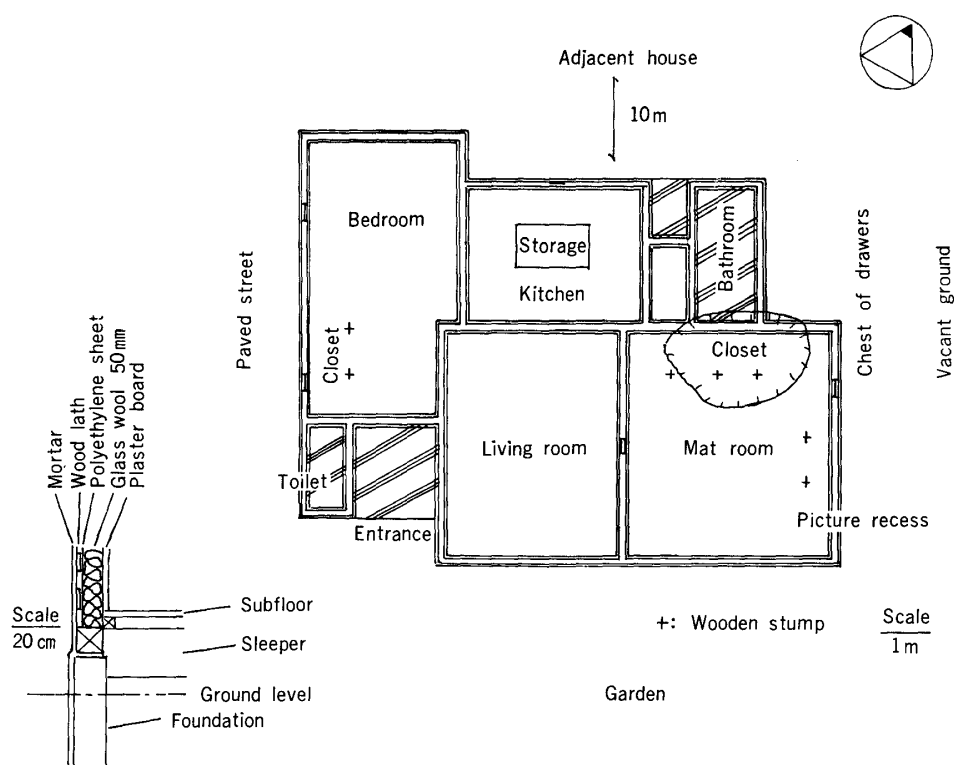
The foundation plan and the details of the floor constitution (Case 4).
